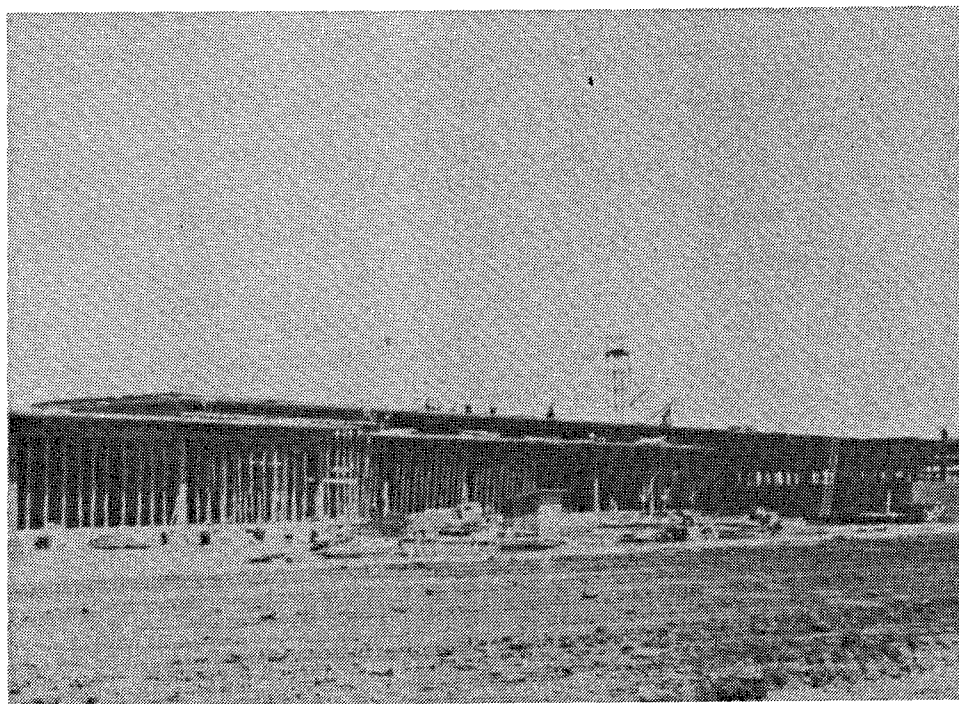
Overview of LCOP Tool and Gauge Shop construction, 1941 (original photograph on file, LCAAP).
